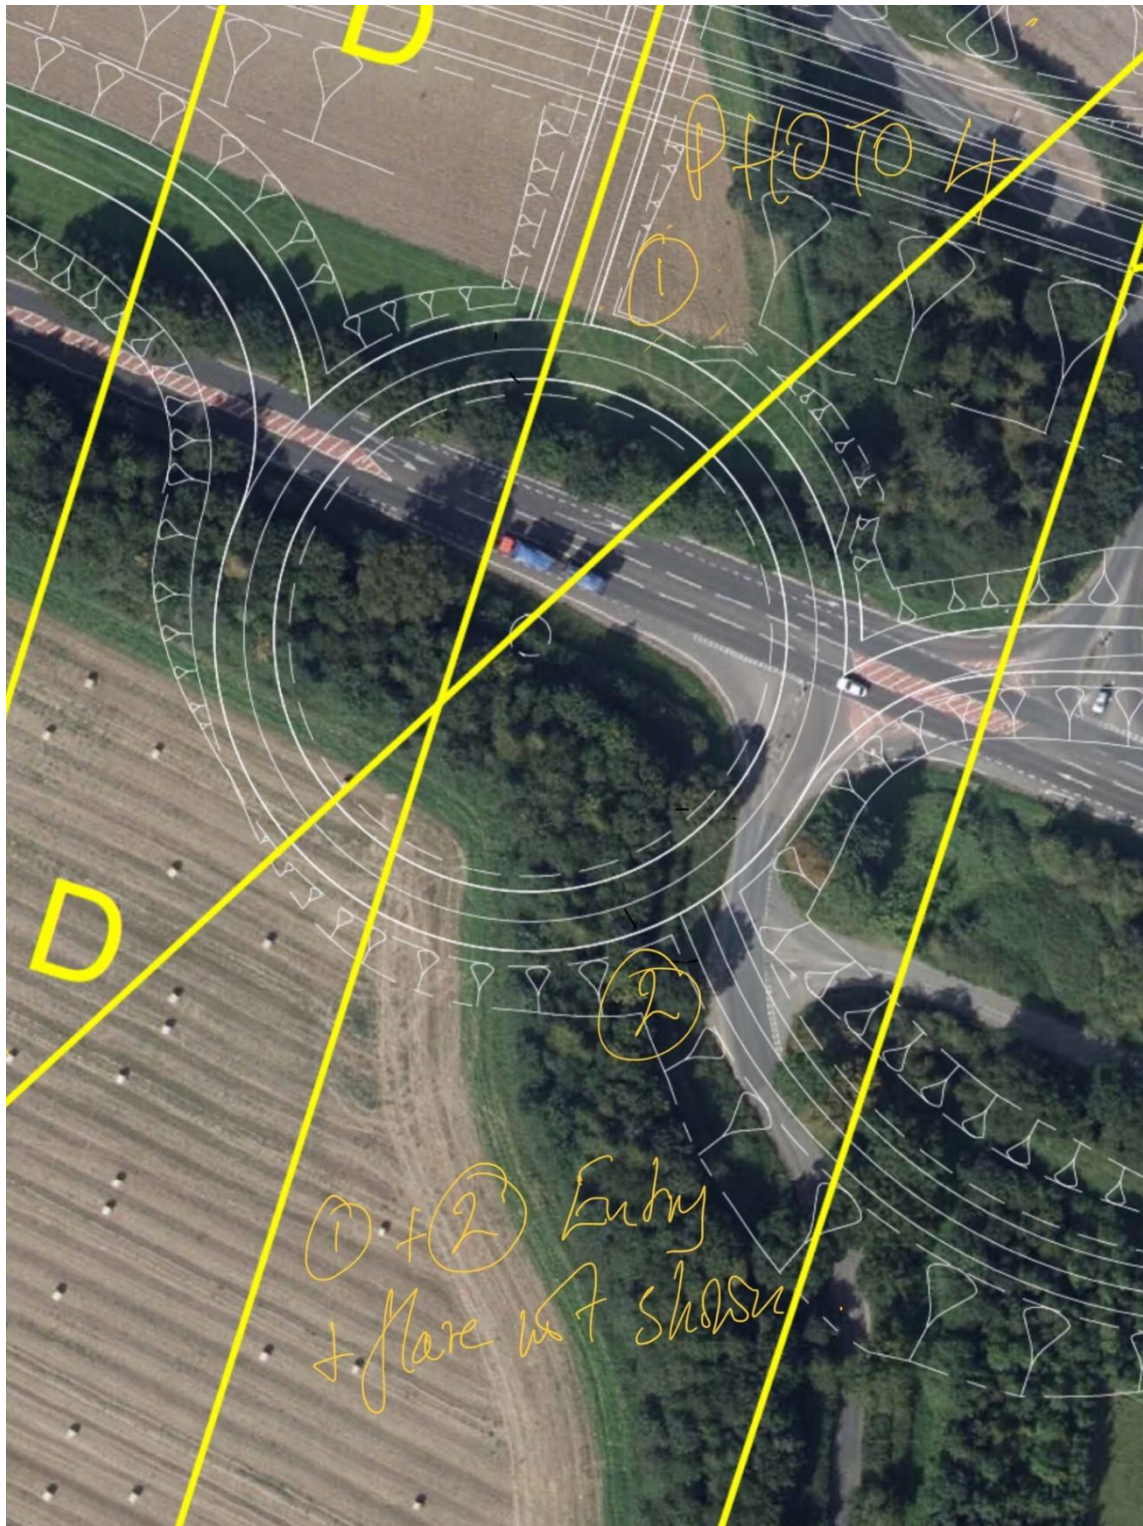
Wood Lane Junction south dumbbell with 80m roundabout overdrawn as sketch, aligned with north side as existing with indicative entry and flares.
